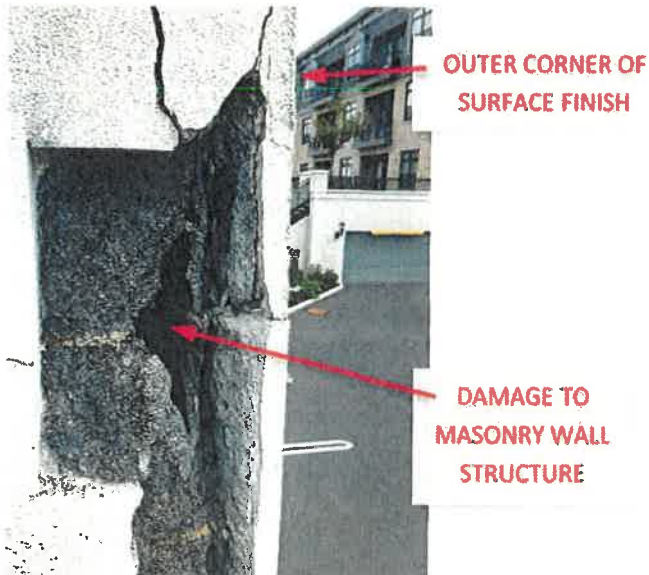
Invasive Inspection of Masonry Wall Structure at Corner
